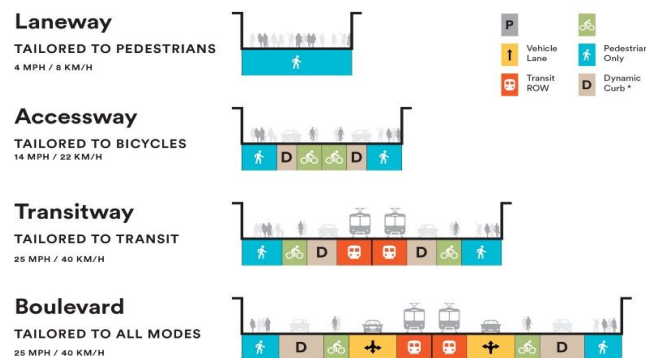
Sidewalk Labs' designs for different types of streets in Sidewalk Toronto
